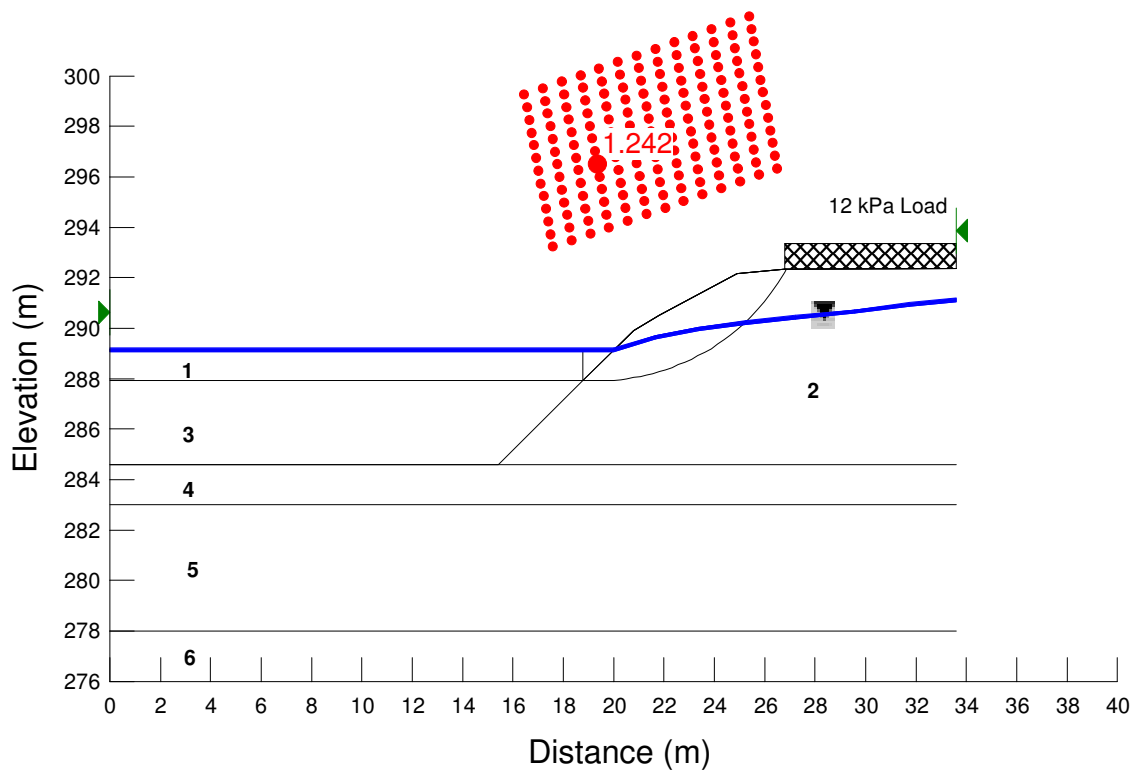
Stability of HWY11 Road Section at Sta. 14+900
